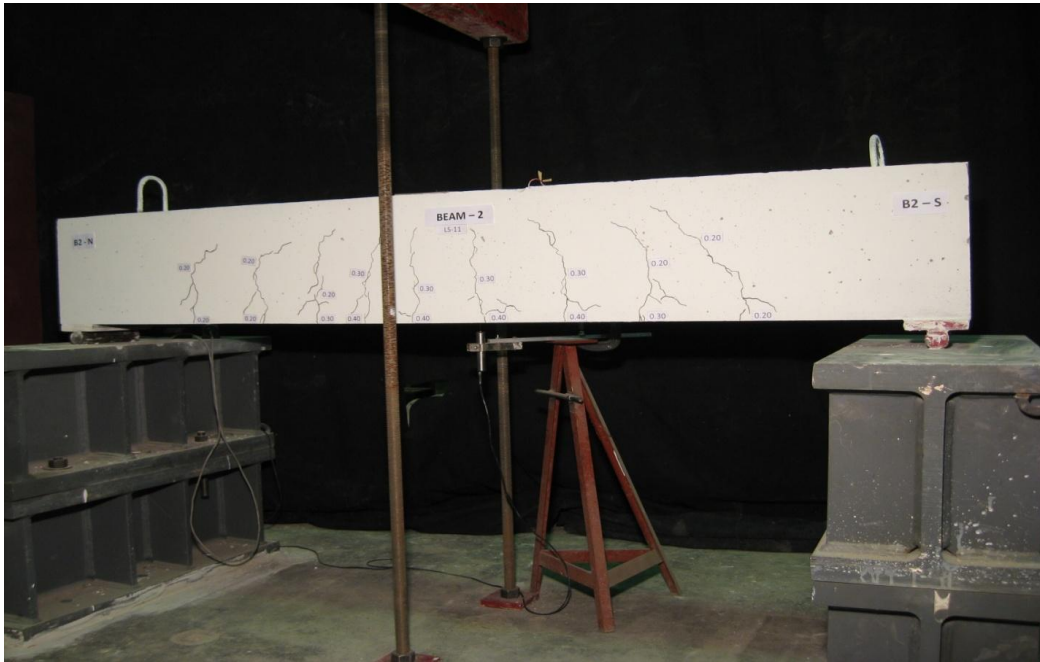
Cracking pattern for beam 2 at a load of 95.4 kN (B2-LS11)
